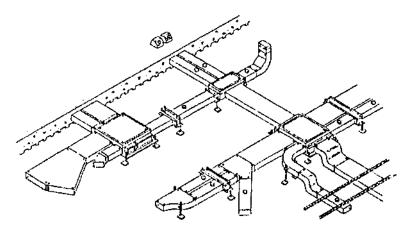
Underfloor ducts. (From Means, 1986.)
